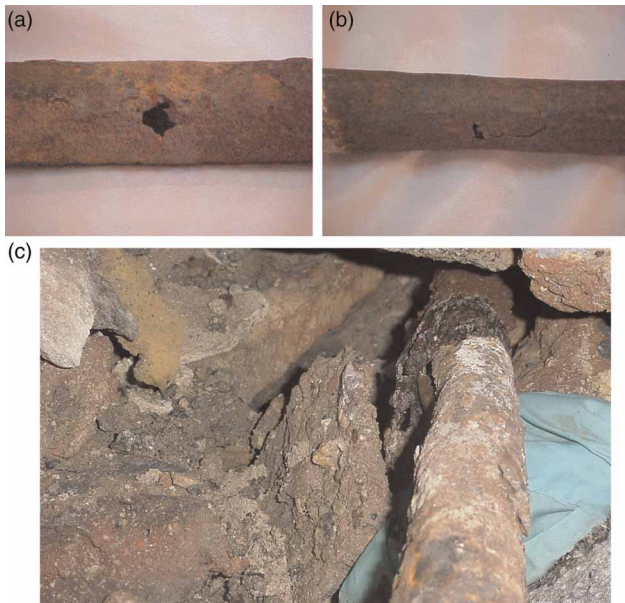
| Holes and longitudinal cracks in corroded property connections: (a) longitudinal cracks; (b) corrosion holes; (c) general view.
